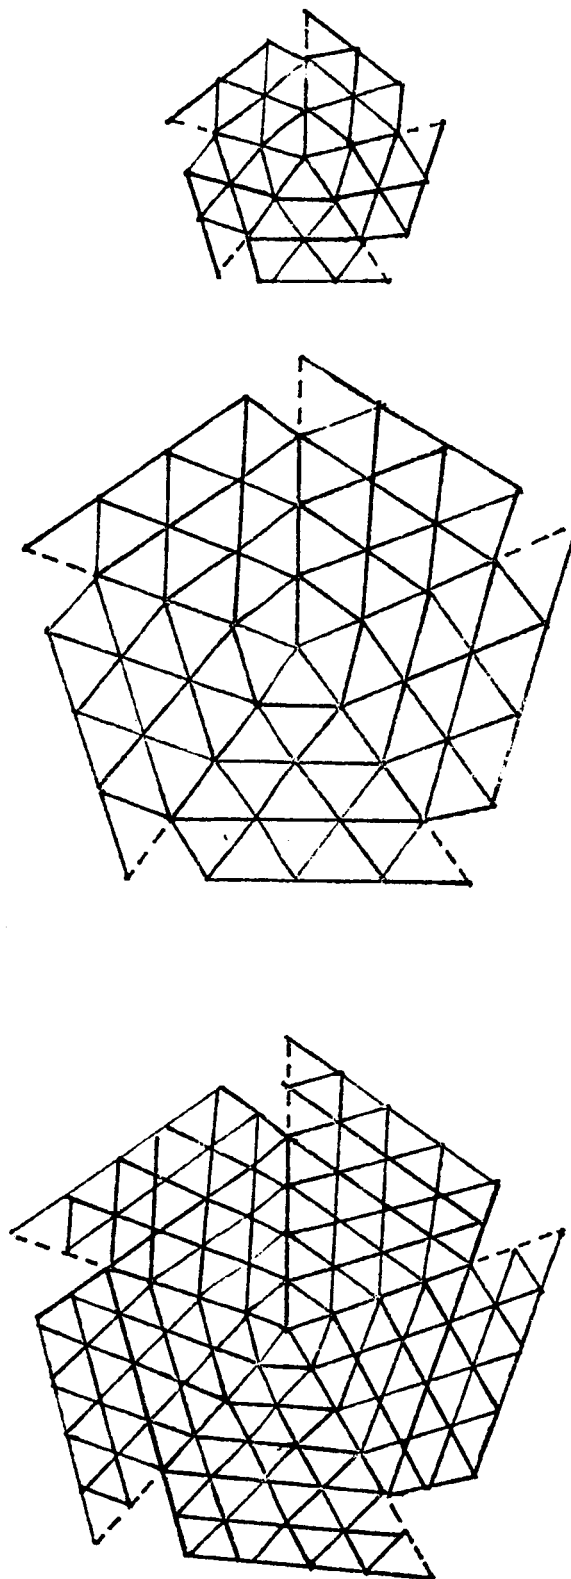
Exploded View of 2V, 3V, and 4V Domes
